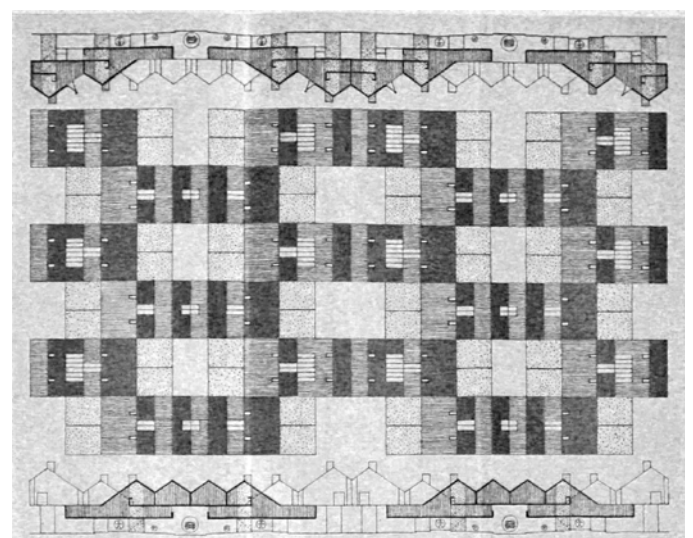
Site plan, De Kasbah [source: Hidden Architecture, 2013]
